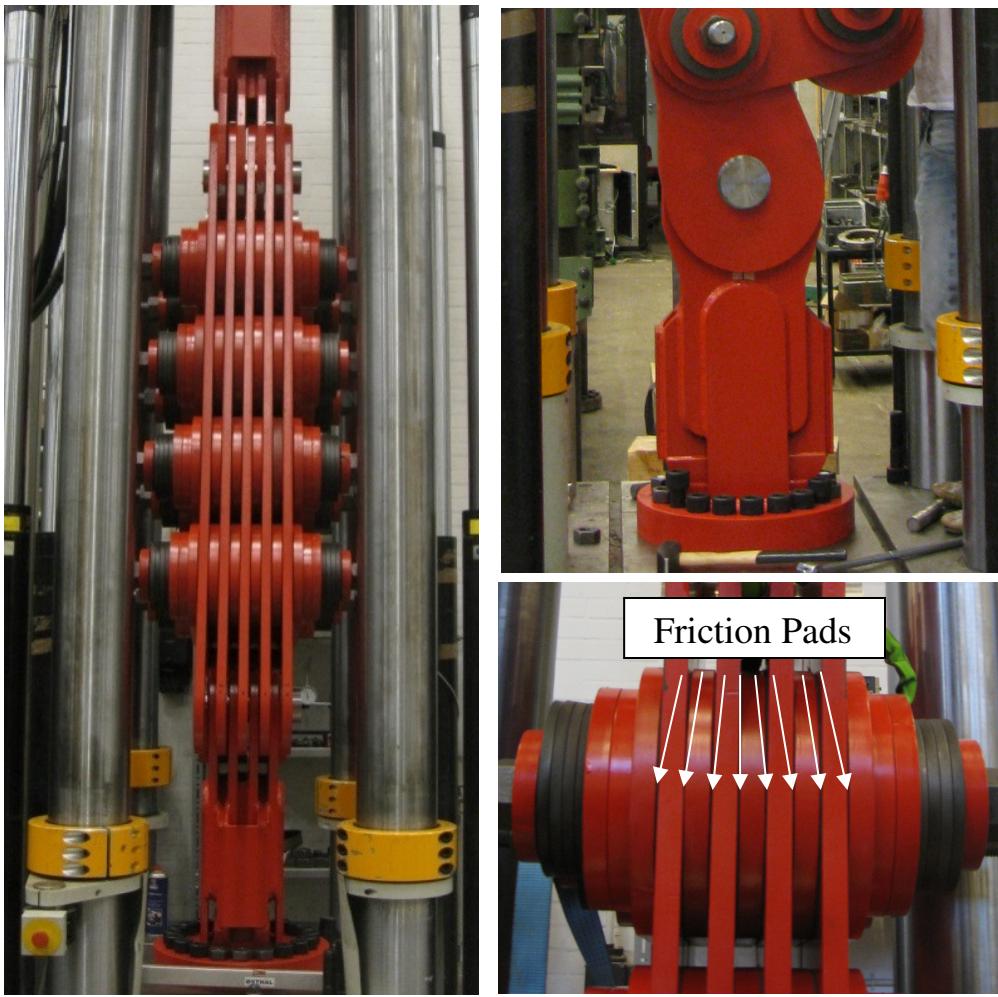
Left: side view of 5000 kN damper. Top Right: Connectors connecting the damper to the testing machine. Bottom right: Friction pads between steel plates.
